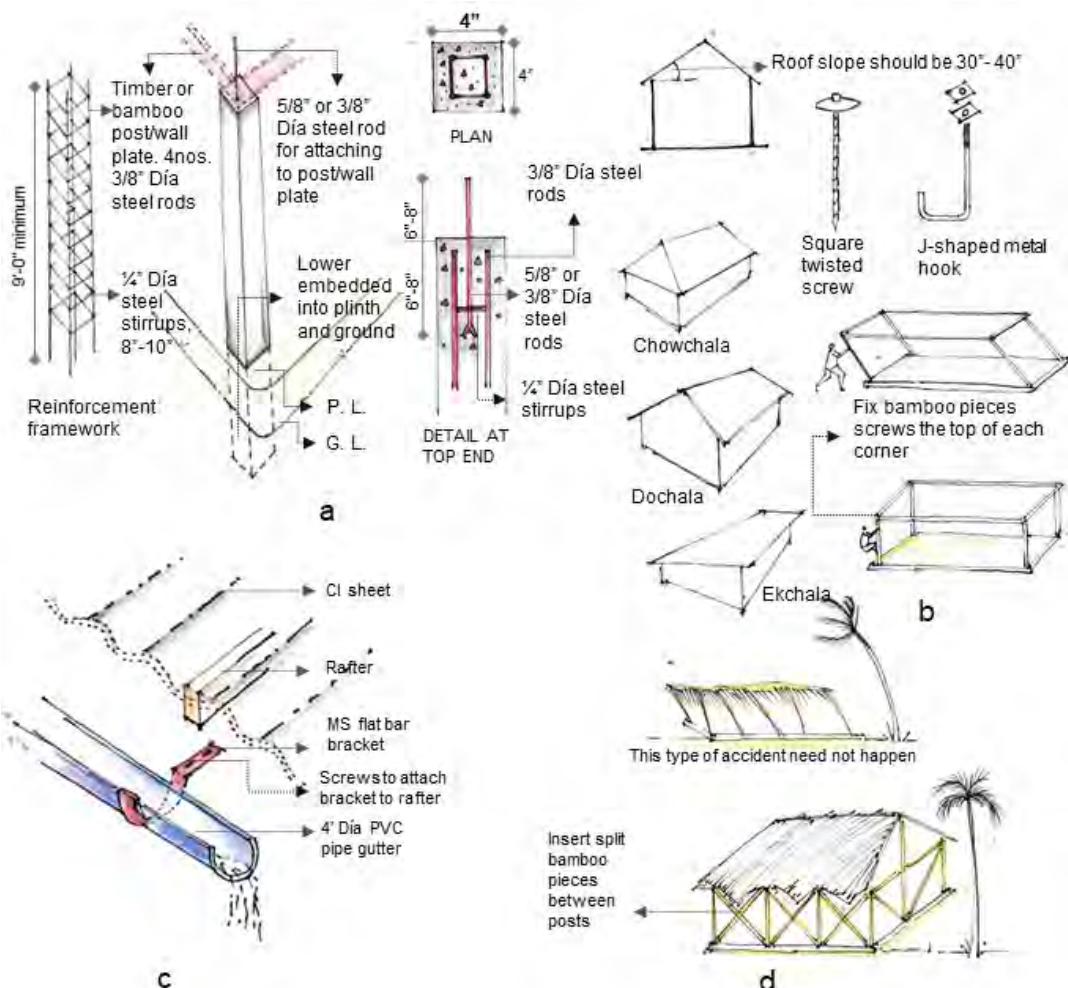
a. Reinforced concrete post b. Basic features of wind-resistant roofing. c. PVC pipe rainwater gutter detail. d. Cross-bracing of bamboo structural frame. (Source: after, ADPC 2005)
